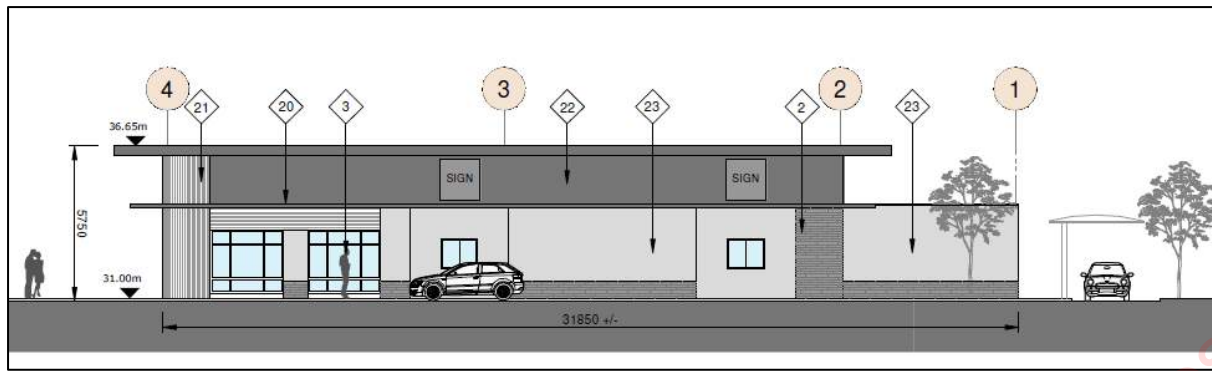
North elevation of the proposed Drive-Thru unit (Phase 3).
